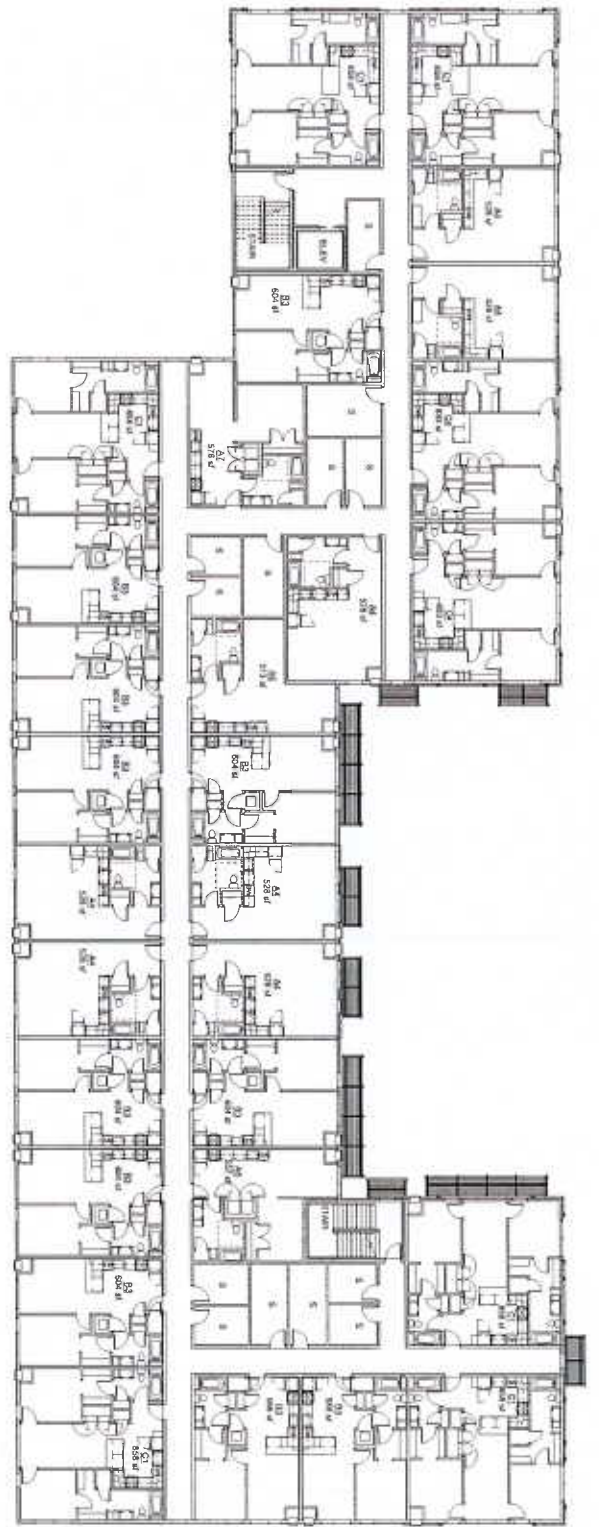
SECOND LEVEL FLOOR PLAN - MAIN
